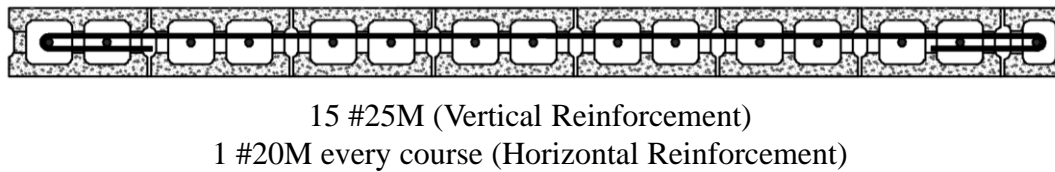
Cross sections of RM walls used to assess the response limits of blast loads
